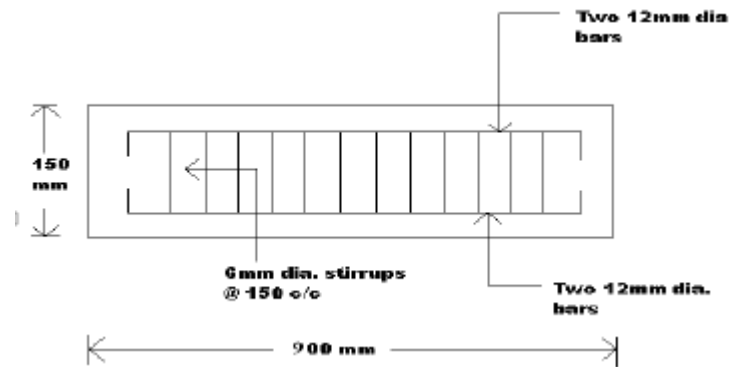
Beam reinforcement detailing by Arivalagan.S (2013)
